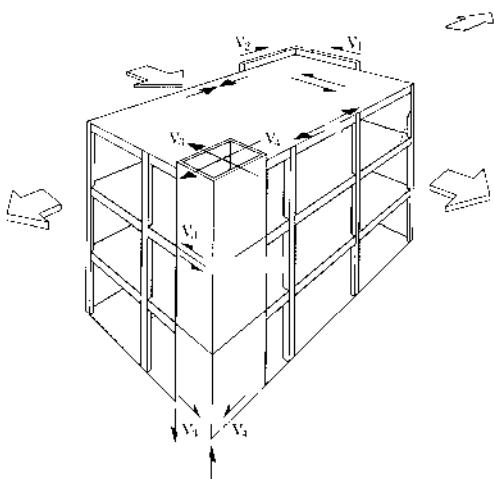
The connections should be designed consistently with the intended structural behaviour
